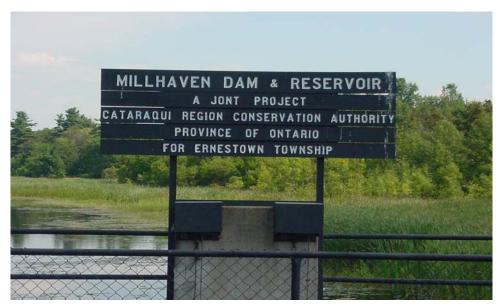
DAM IDENTIFICATION SIGNAGE
